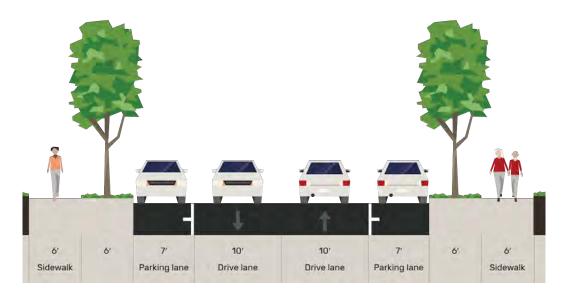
B: EXISTING LOCAL STREET CROSS-SECTION WITHOUT CURB (SOURCE: STREETMIX)
